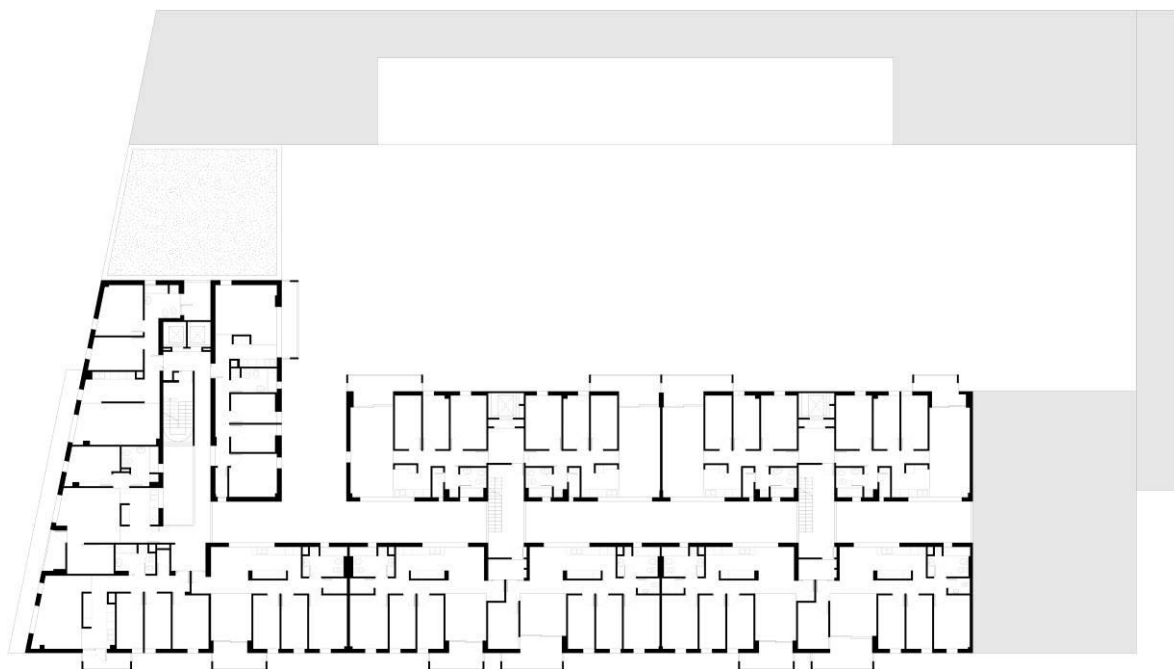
Flexo Arquitectura. VPO Social Housing building at Colonia Castell (Barcelona). Typical floor plan. Source: Redraw by M. Lucchini
